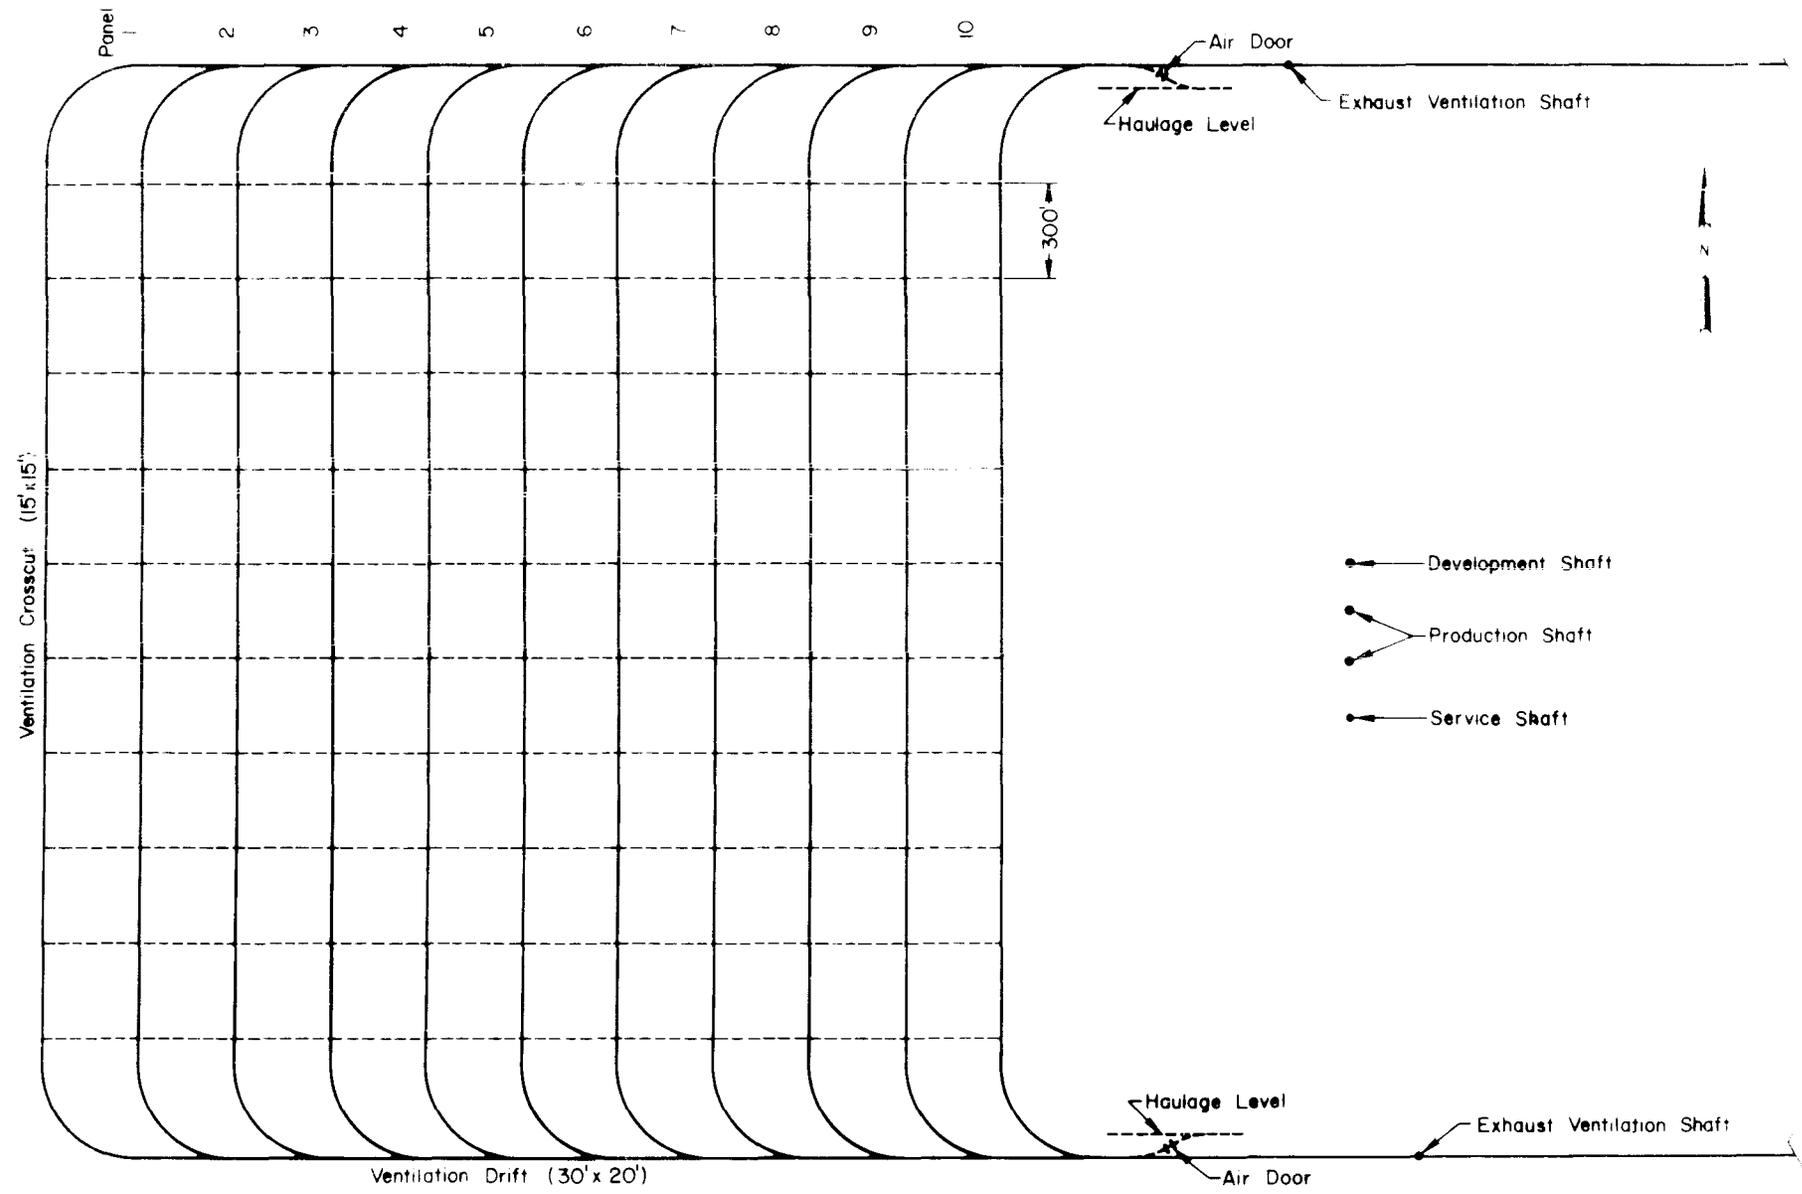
Plan View of Ventilation Level, Block Caving with Slushers
